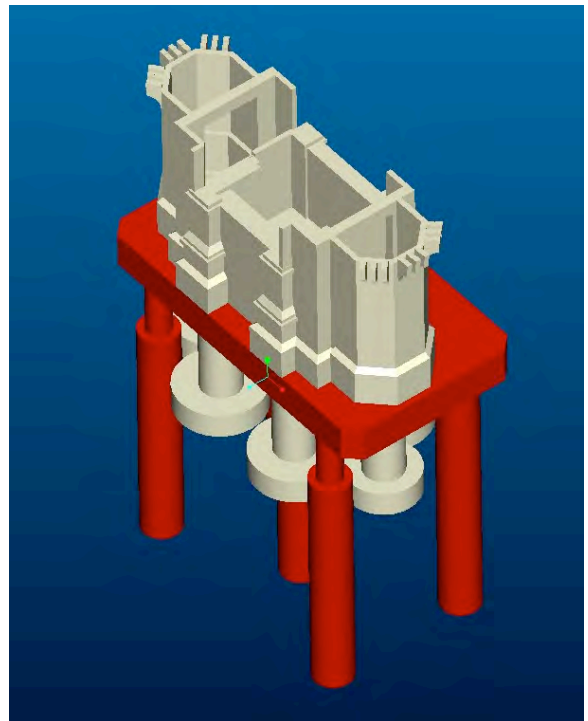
Computer Rendering Showing the Existing Pier and the New Waterline Footing
